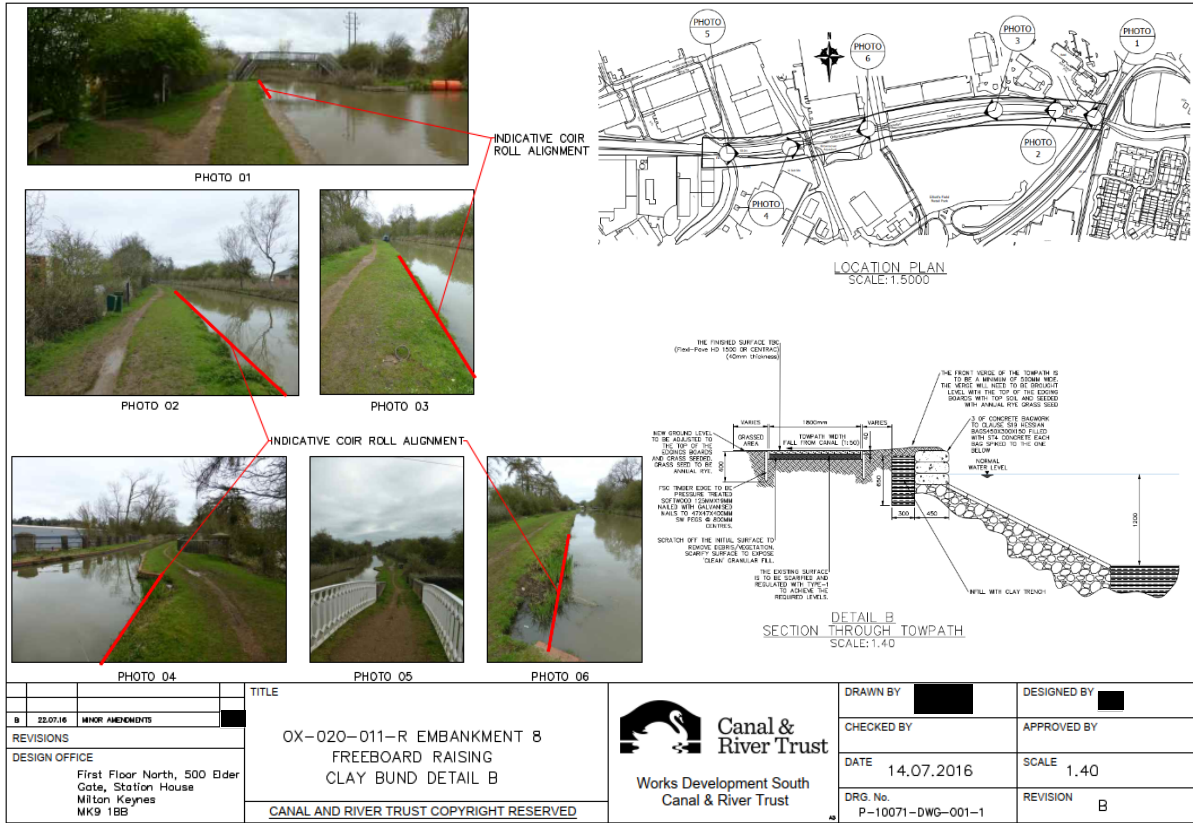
Typical Detail for Raising an Earthen Canal Bank
